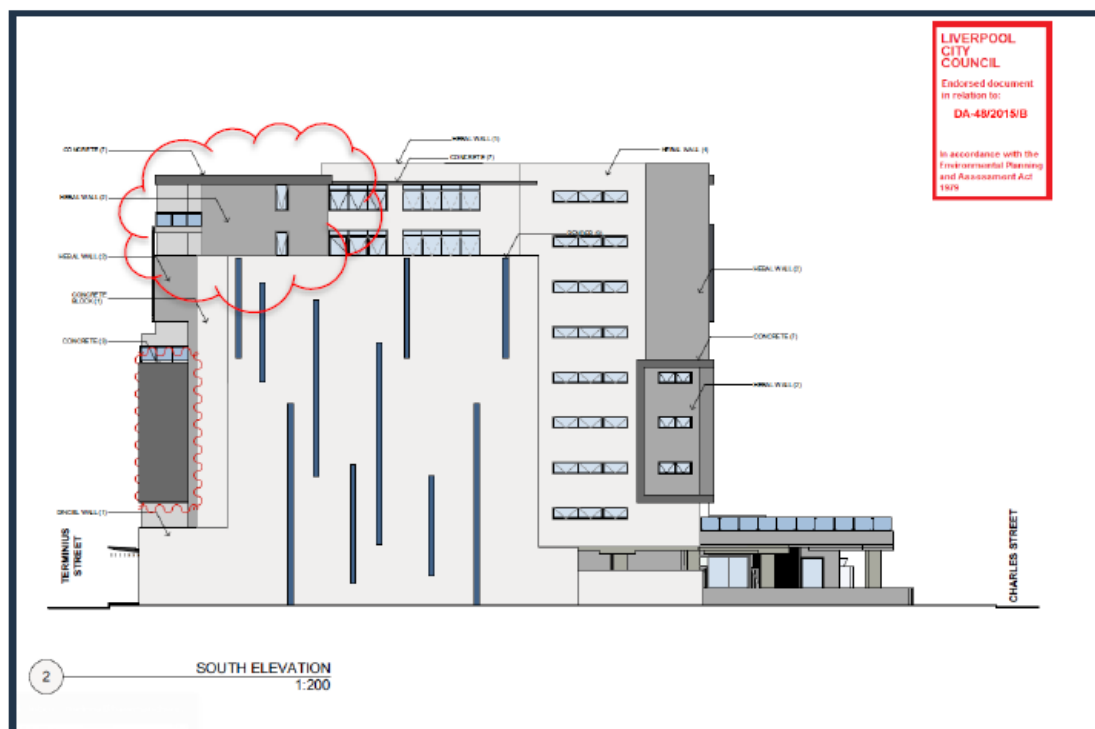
South Elevation of adjoining mixed-use building at 166-176 Terminus Street, Liverpool approved under DA48/2015. The area within red cloud denotes the building depth of Level 7 & 8 and does not extend the length of the site.
